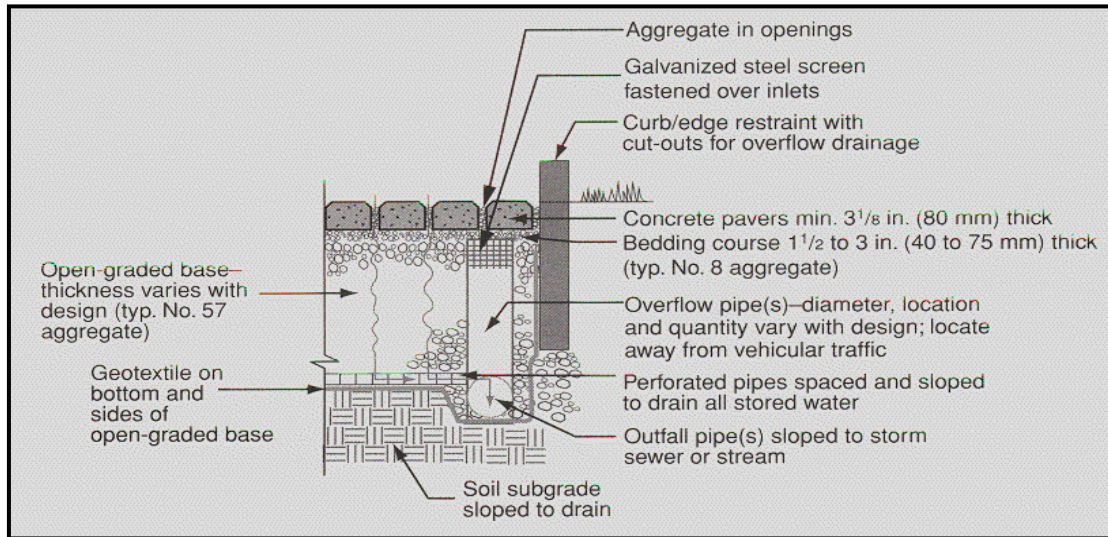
Figure IV: Permeable Interlocking Concrete Pavement – No Exfiltration (Source: ICPI, 2000)
